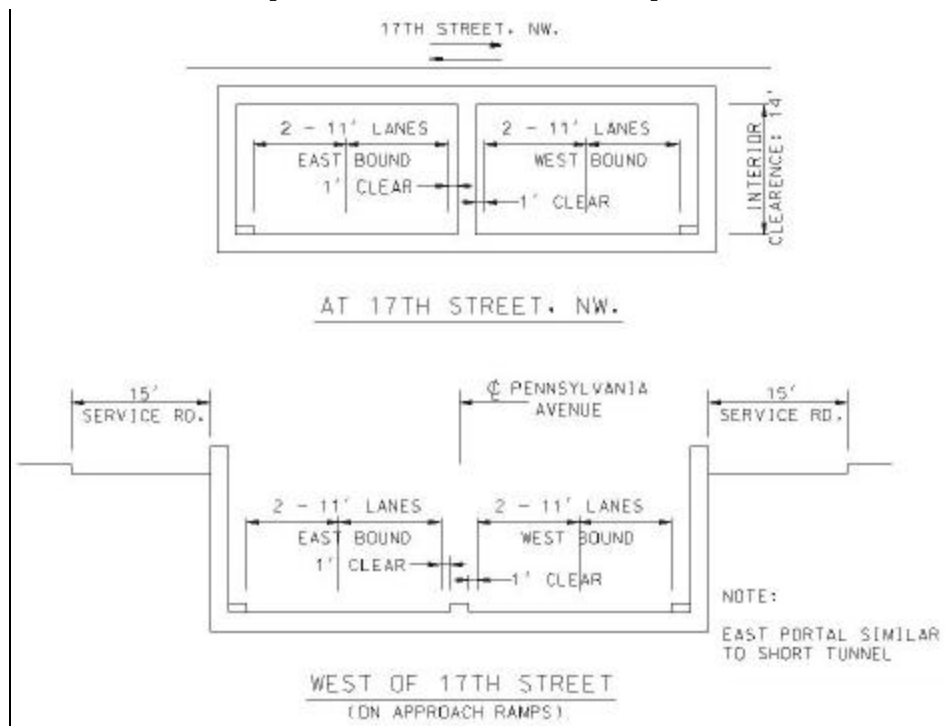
Preliminary Intermediate Tunnel Cross-Sections
